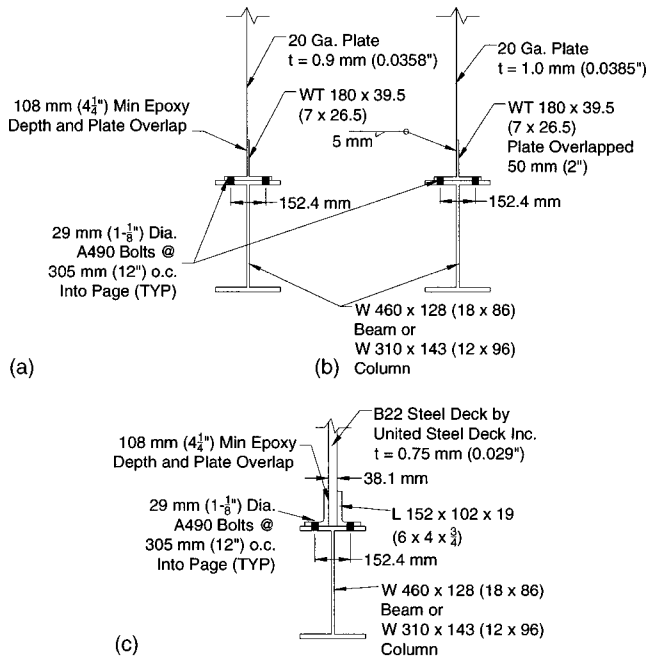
Infill-to-boundary frame connections (a) Specimen F1 (b) Specimen F2 (c) Specimen C1
